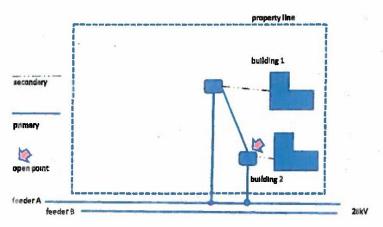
2 BUILDING CONNECTION greater than 1,000kVA
